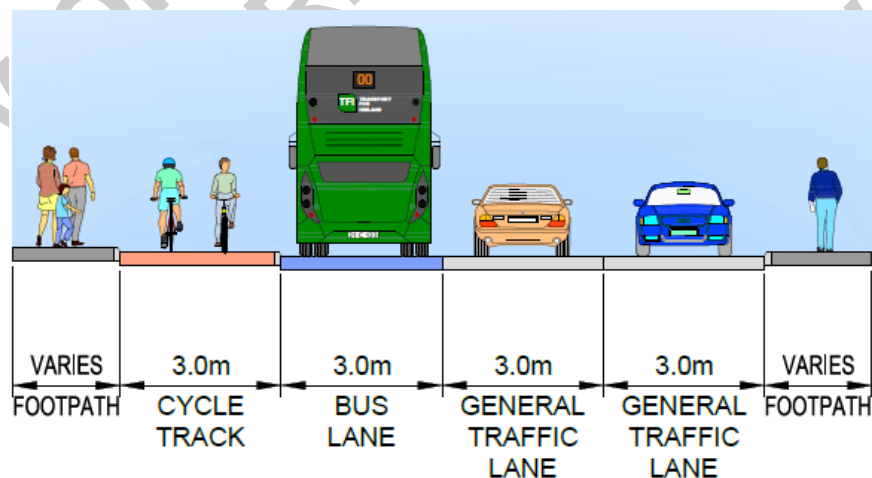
Section 2C, Proposed Option 4 – Cross Section B-B
